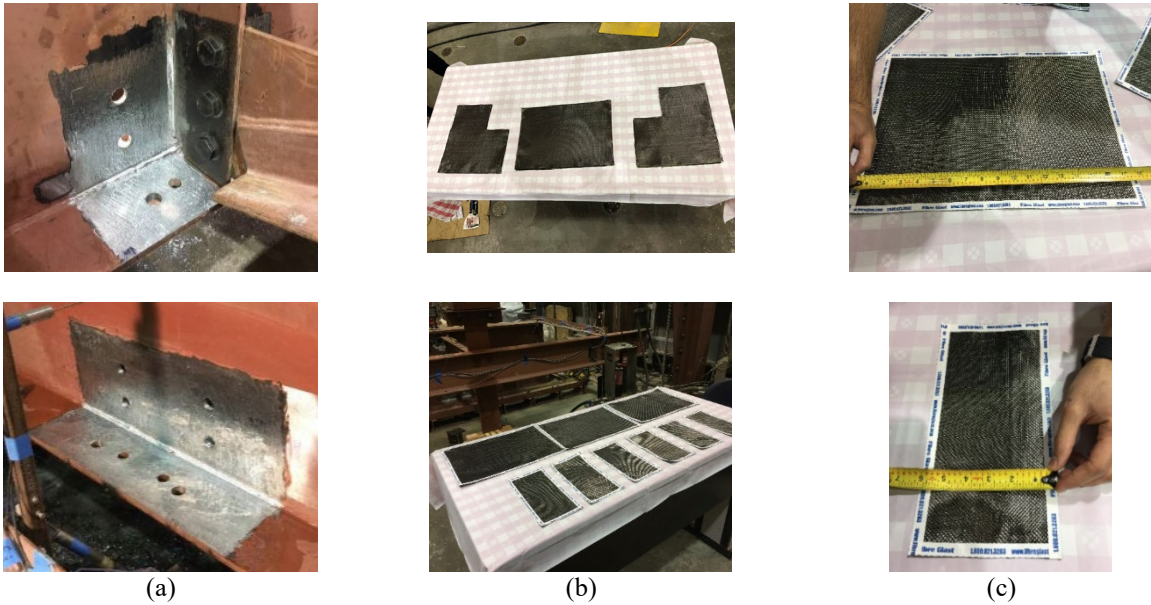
Material preparation for CFRP application: (a) Steel girder surface after preparation; (b) CFRP detailing; (c) CFRP configuration C1 dimensions
